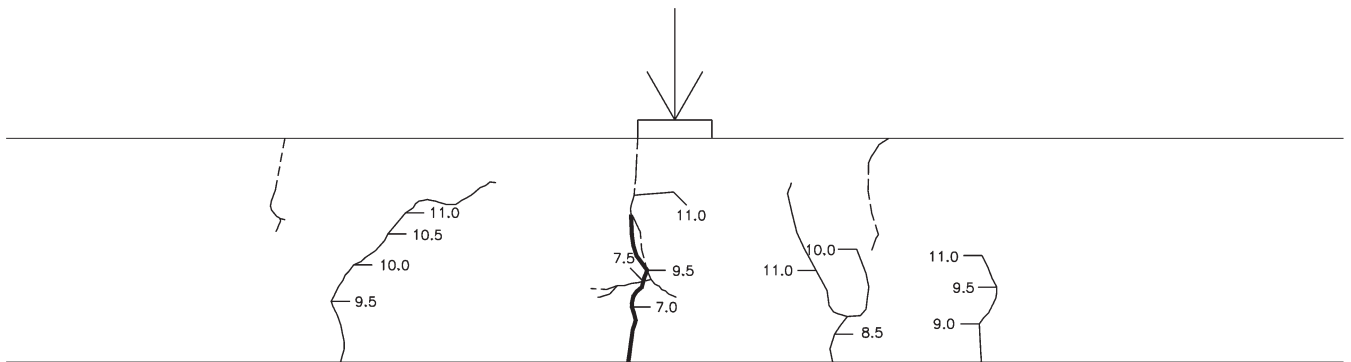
Crack patterns at failure of single-strand development length specimen 2L.
